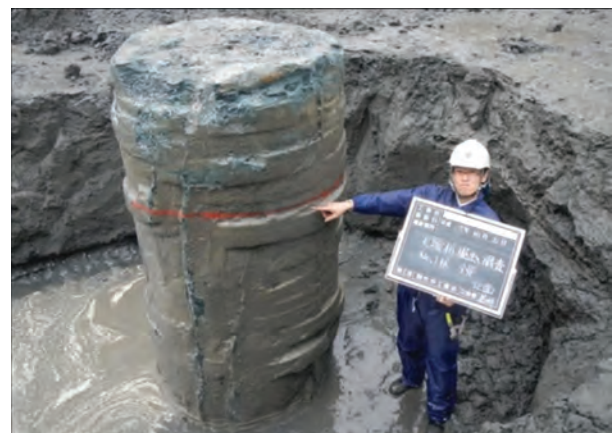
Excavation and filling of cast-in-place piles ^[16]
